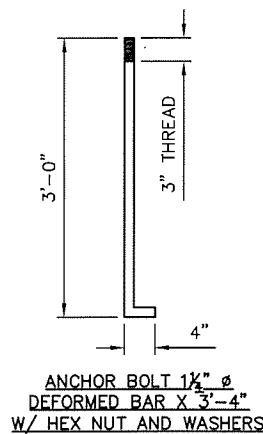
DETAIL OF ANCHOR BOLT & CONDUIT PLACEMENT
